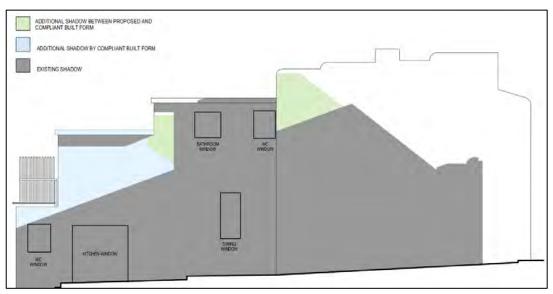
Overshadowing impacts at 3PM to northern side elevation of 12 Rawson Avenue.
